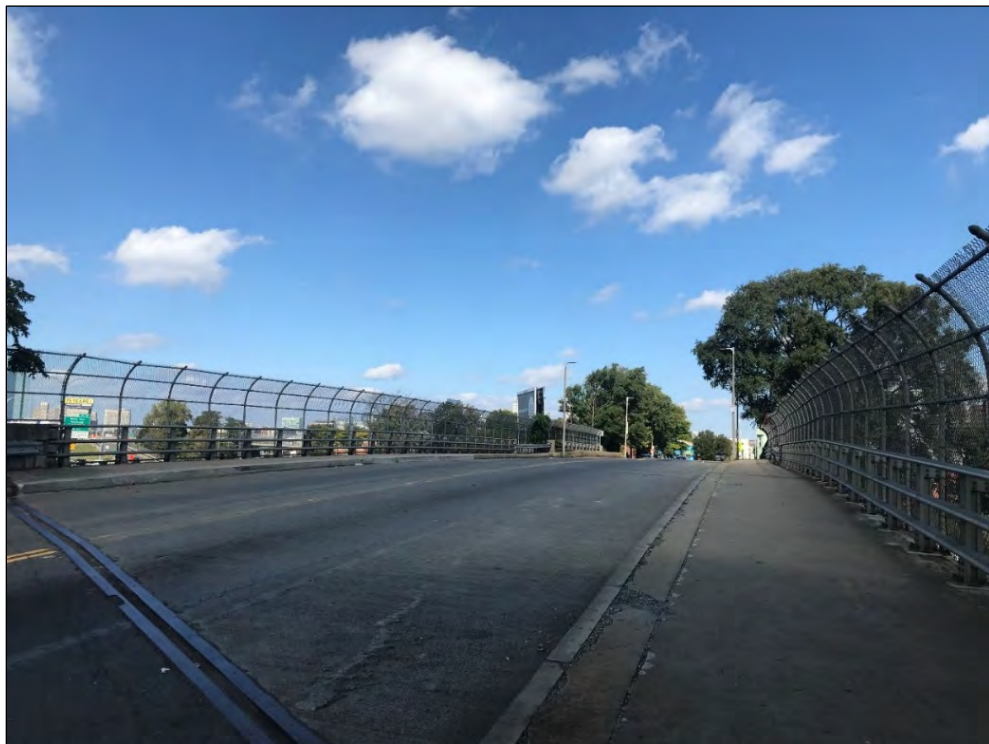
Boston Road crossing I-93 facing north. (10/10/18)
